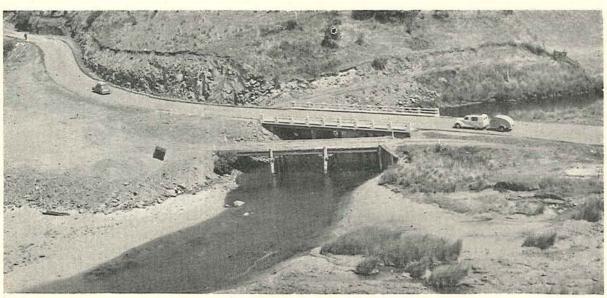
New and Old Bridges on the Ocean Road over St. George River.
